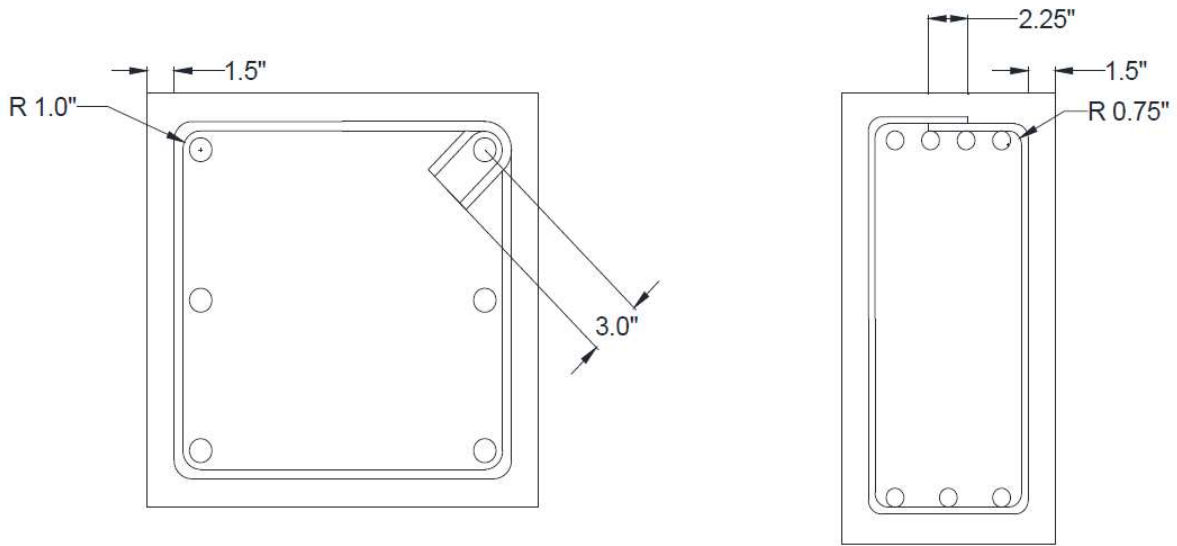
Details of shear reinforcement in original building (Stinger, 2011)
